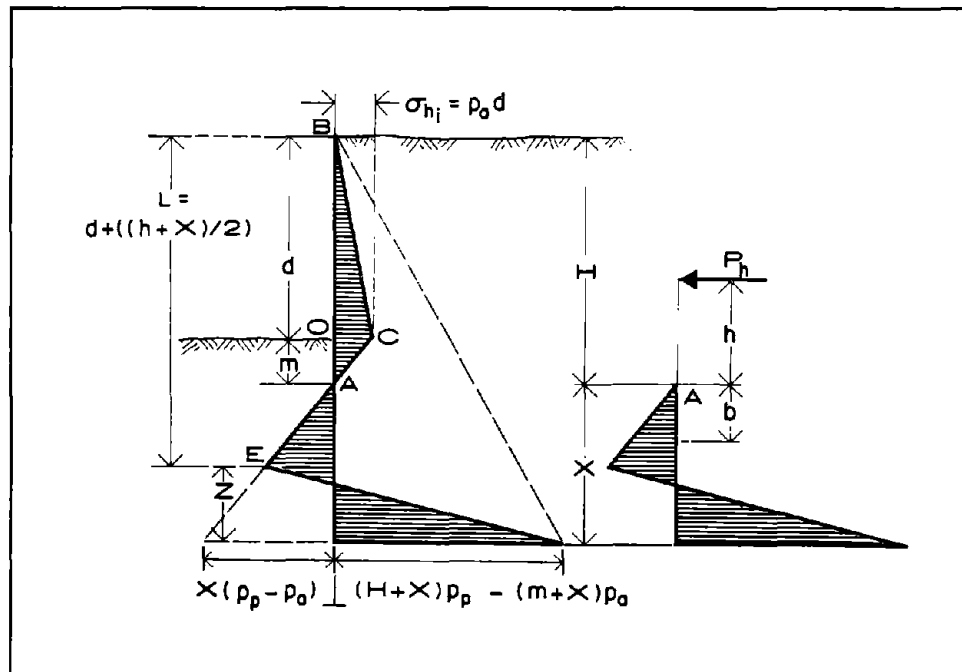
Earth pressure diagram of a cantilever sheet pile wall.
